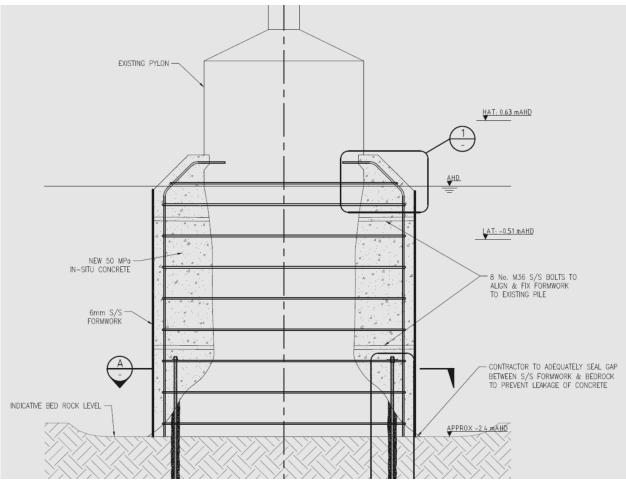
Typical section of stabilisation design. Courtesy of MeND
